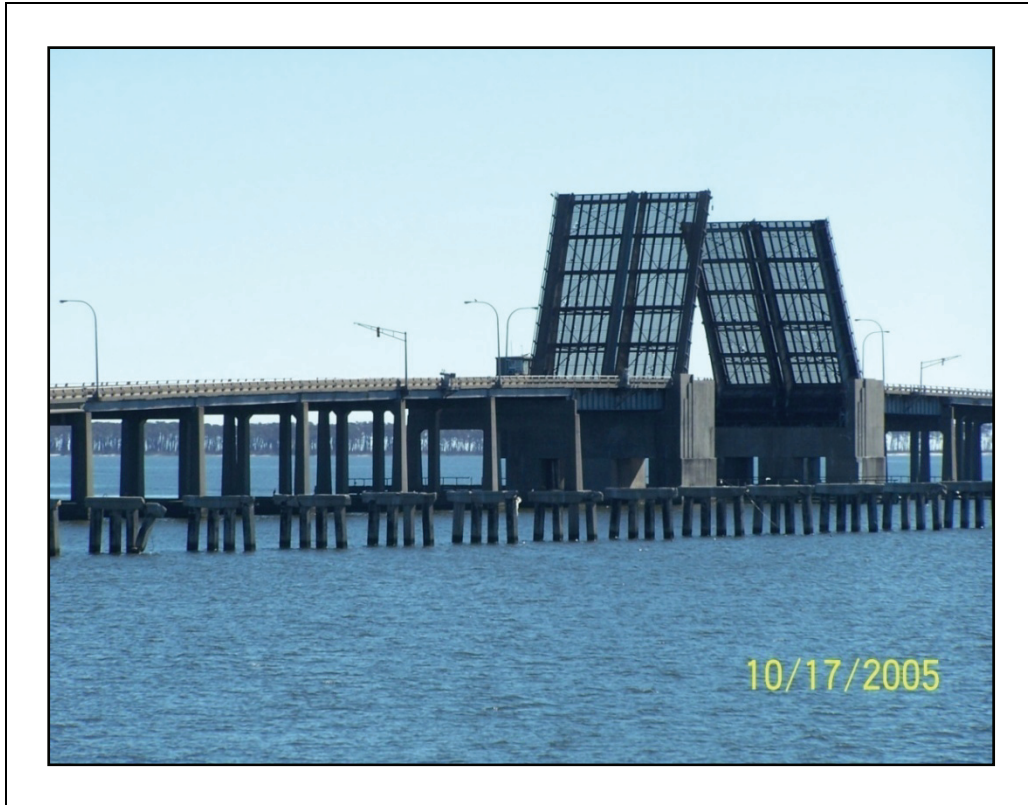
The center spans survived because they were at an elevation above that of the surge level.
